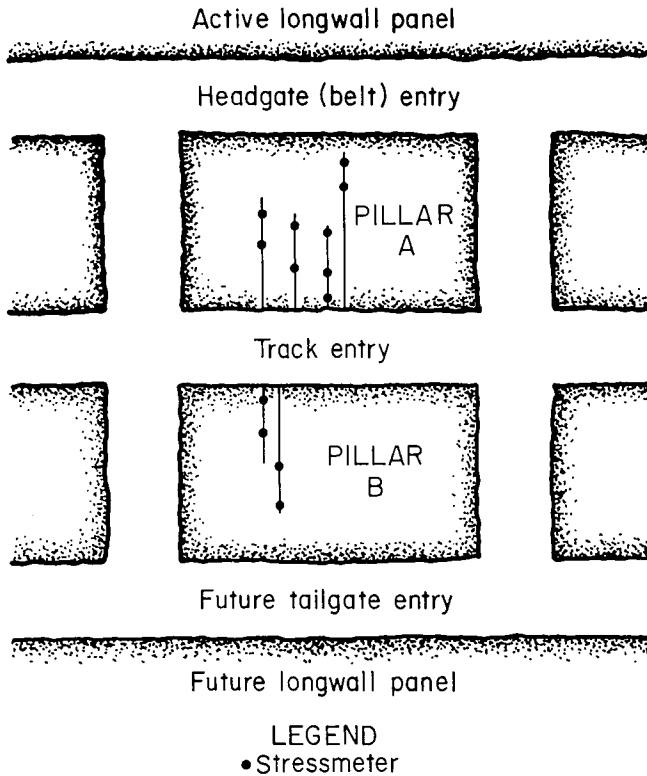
Typical stressmeter array installed to measure abutment stress profiles.
